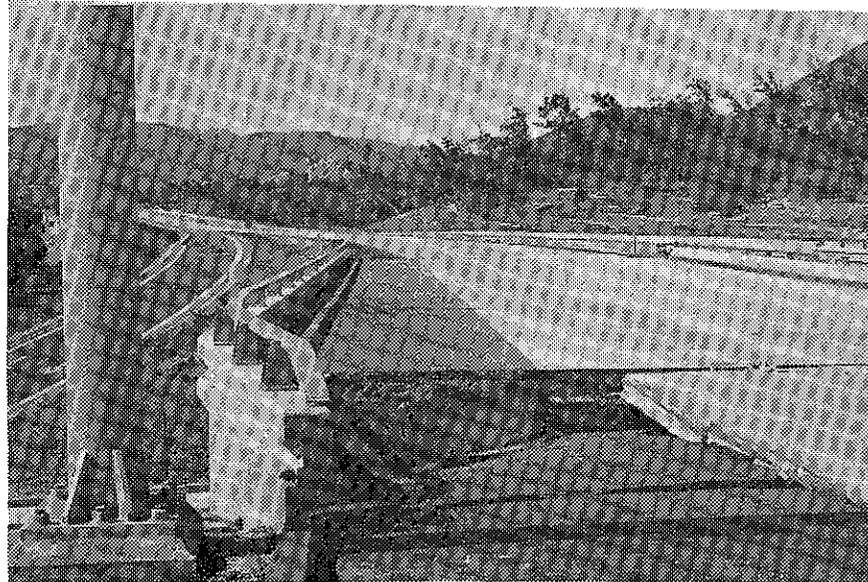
Looking west at the eastbound structure of the Roxford Street Undercrossing. Note rotational movement of structure.
